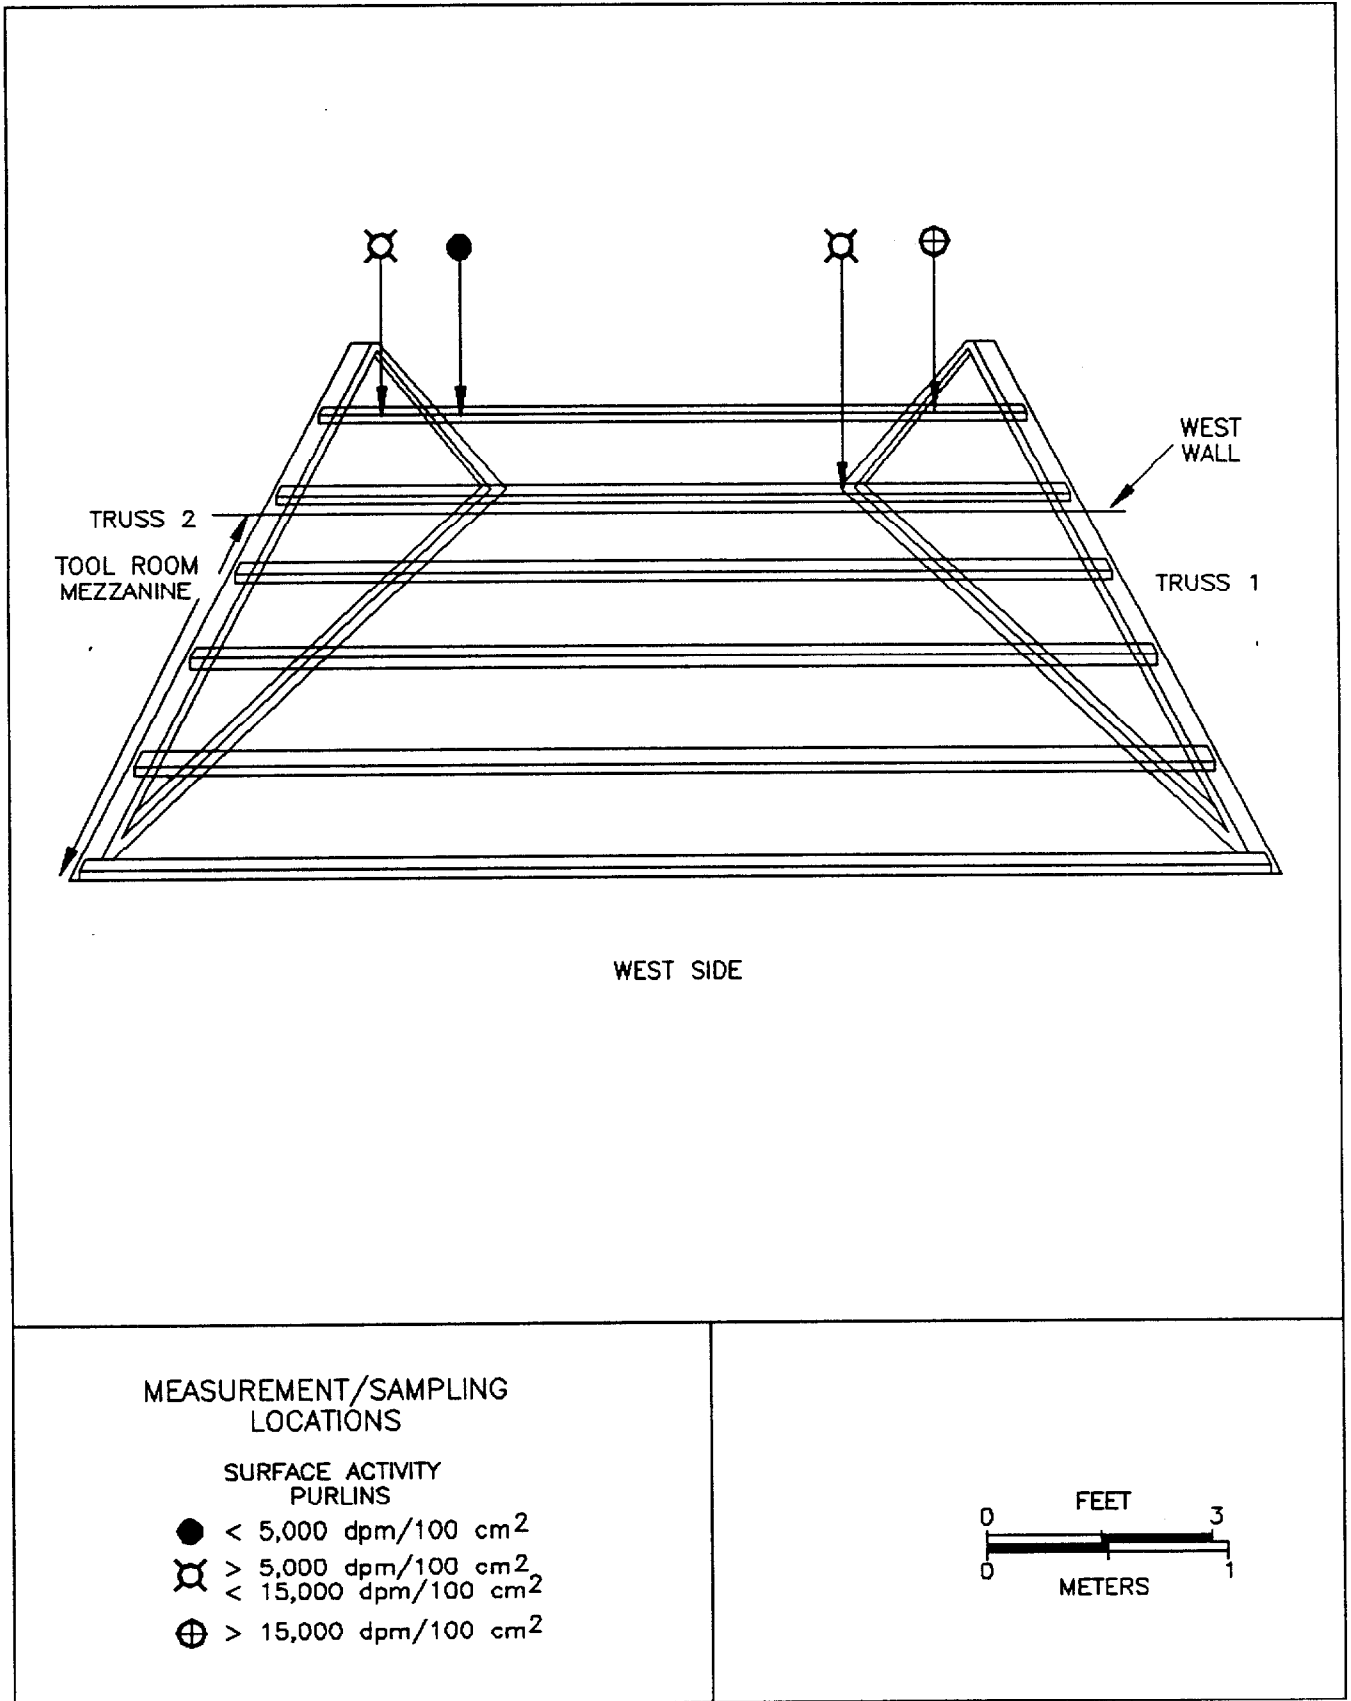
Building 8, Bay 1, West – Measurement and Sampling Locations
